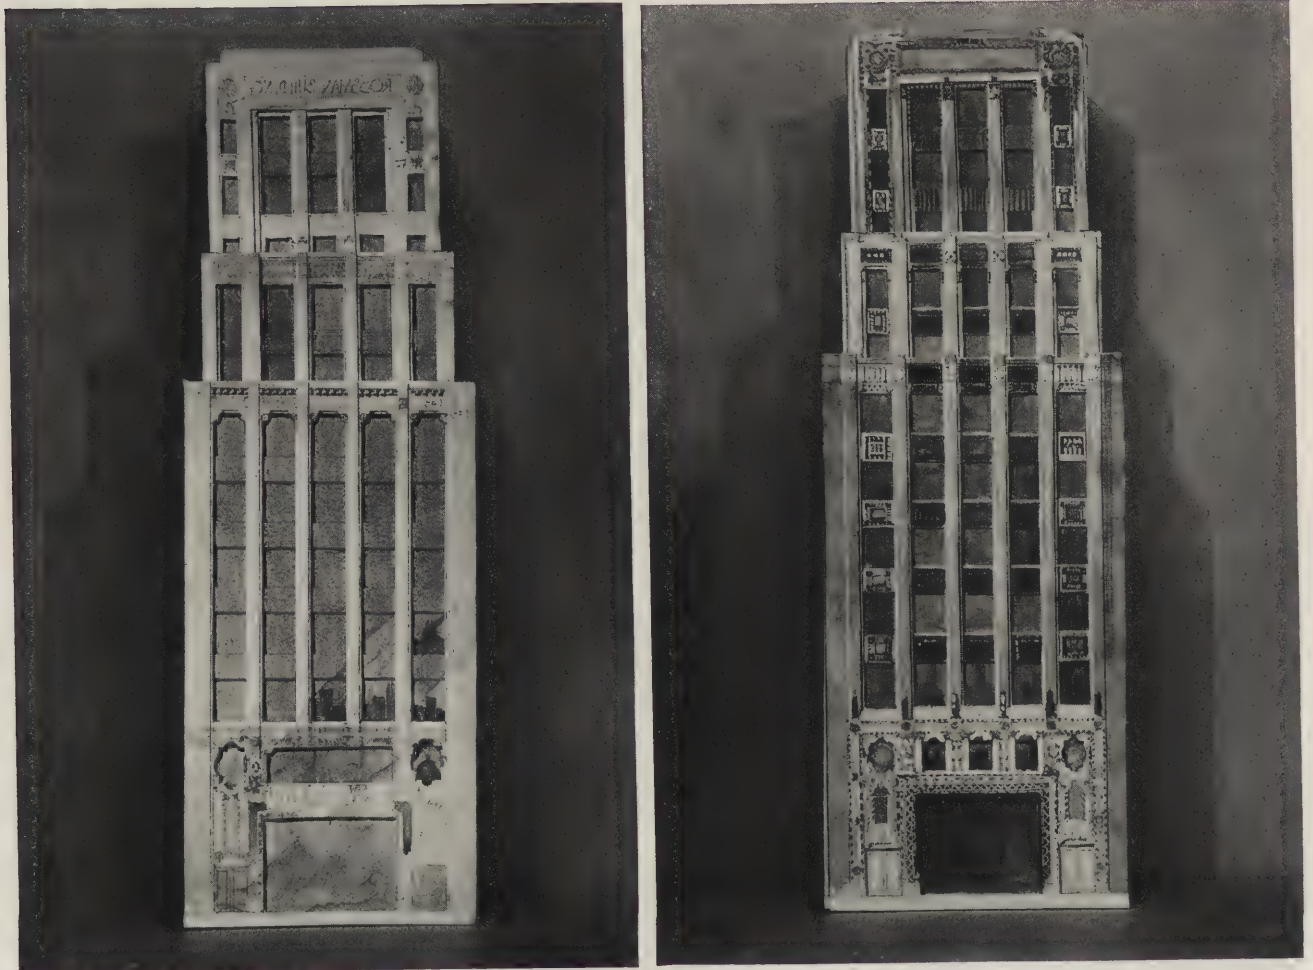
STUDIES OF BUILDING FOR TILE MANUFACTURERS, MADE OF LIGHT ILLUSTRATION BOARD
